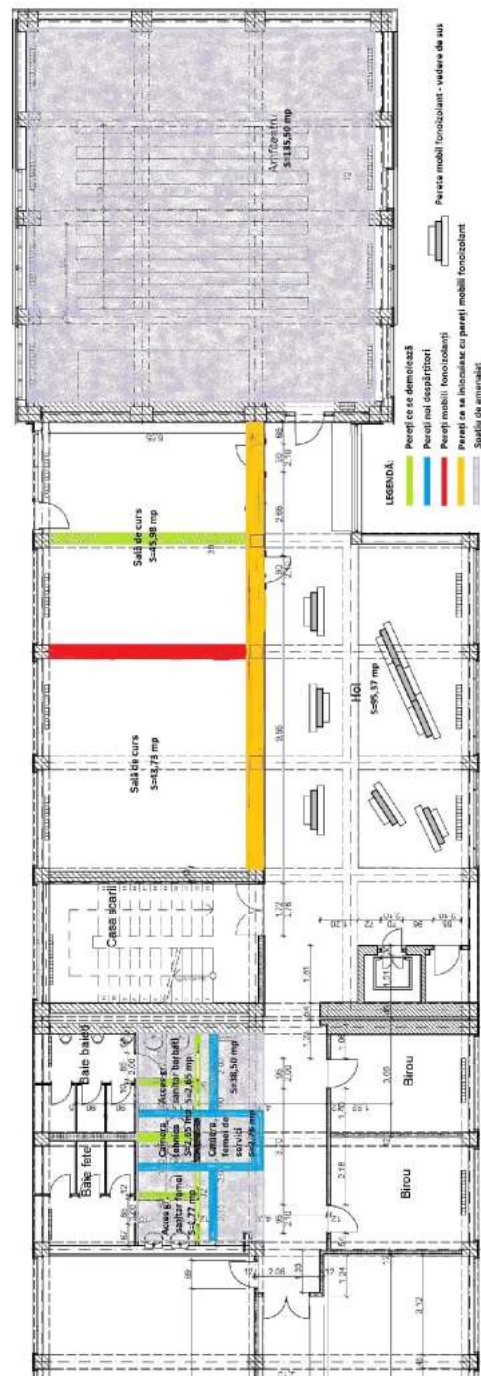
Reconfiguration of the space and installation of soundproofing walls in the hallway
